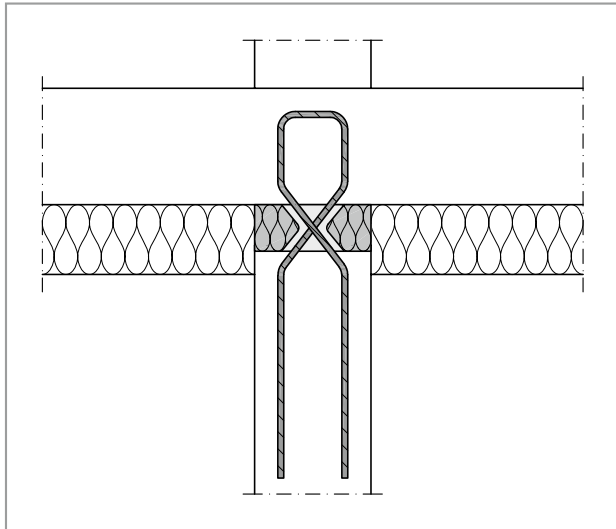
Schöck Sconnex® type W-N-VH: Section B-B, internal wall; below-slab insulation
